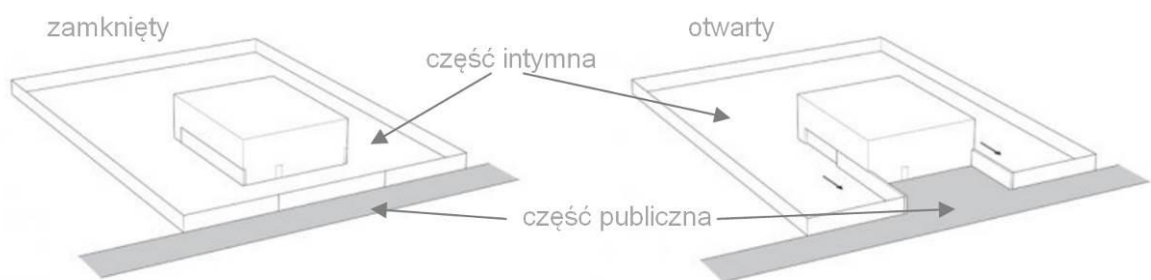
Closed house or open house (Safe House, 2008). Source: kwkpromes.pl / author's study.
